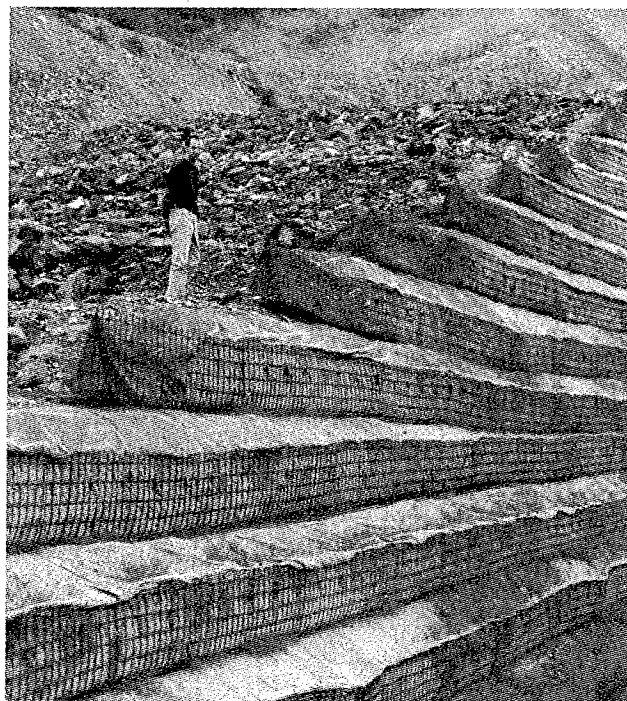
“Etxegarate”: construction stage; note the big vertical spacings
